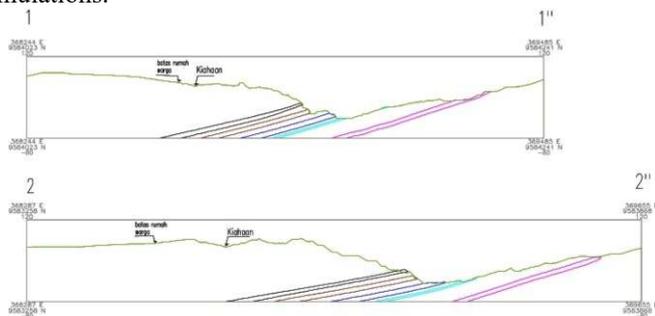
Section of Geometry Bench Pit 1 West Banko
